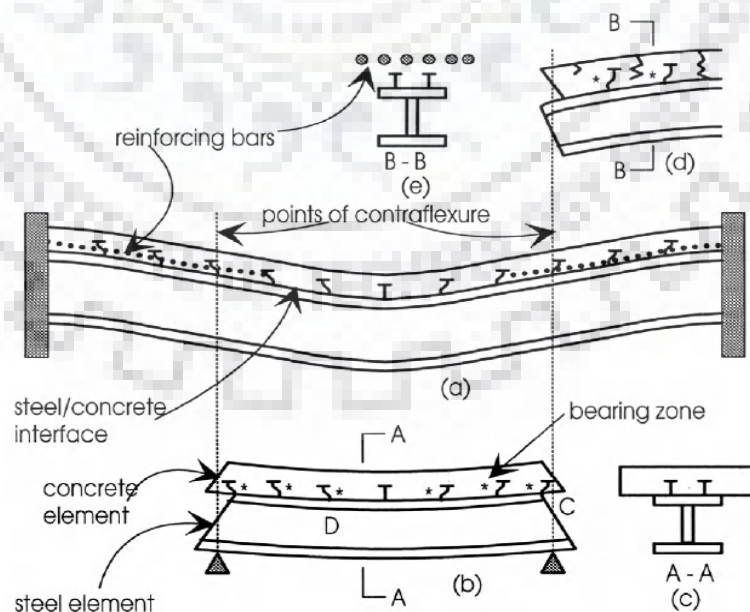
Deformation of composite beam (Oehlers D.J., Bradford M.A., 1999)
